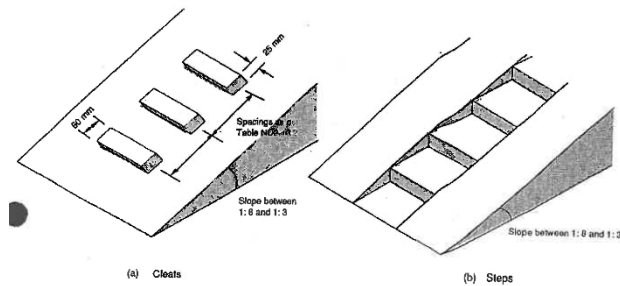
EXAMPLES OF SERVICE RAMPS WITH CLEATS
